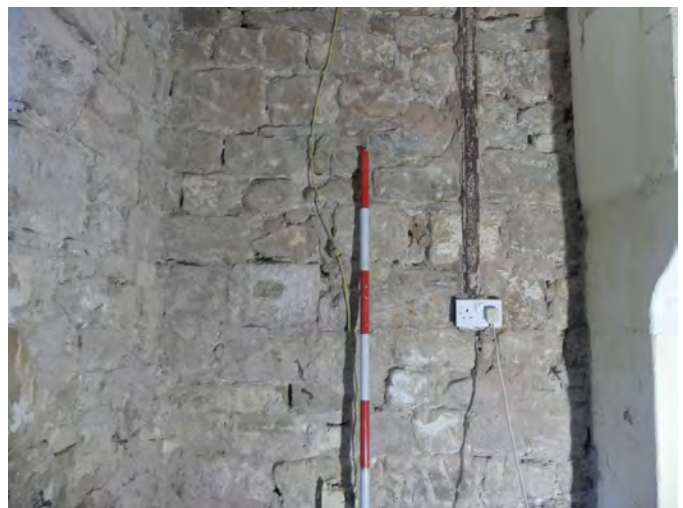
(left): General view of the north-west elevation, Room G1, viewed from the east
